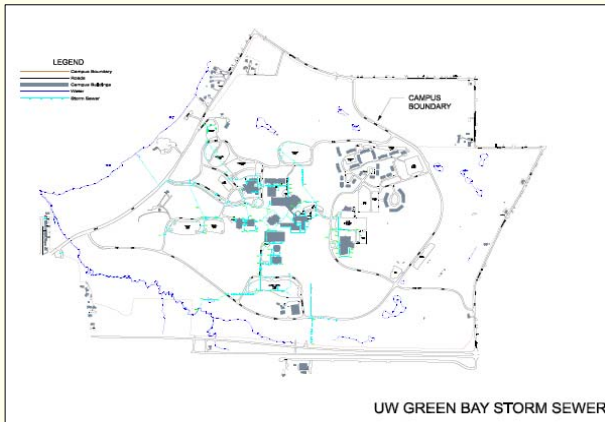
Map of UW-Green Bay campus with existing storm sewer system outlined in pale blue. From OMNI Assoc., UW-Green Bay Draft Stormwater Management Plan.
